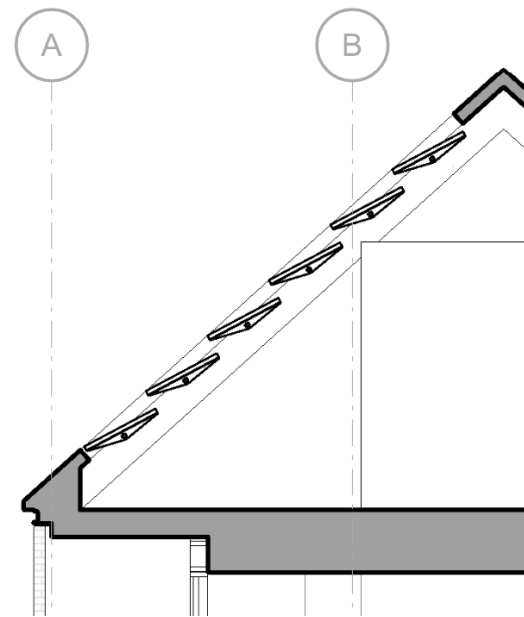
Cross-section through Wharf Lane building showing pitched roof
